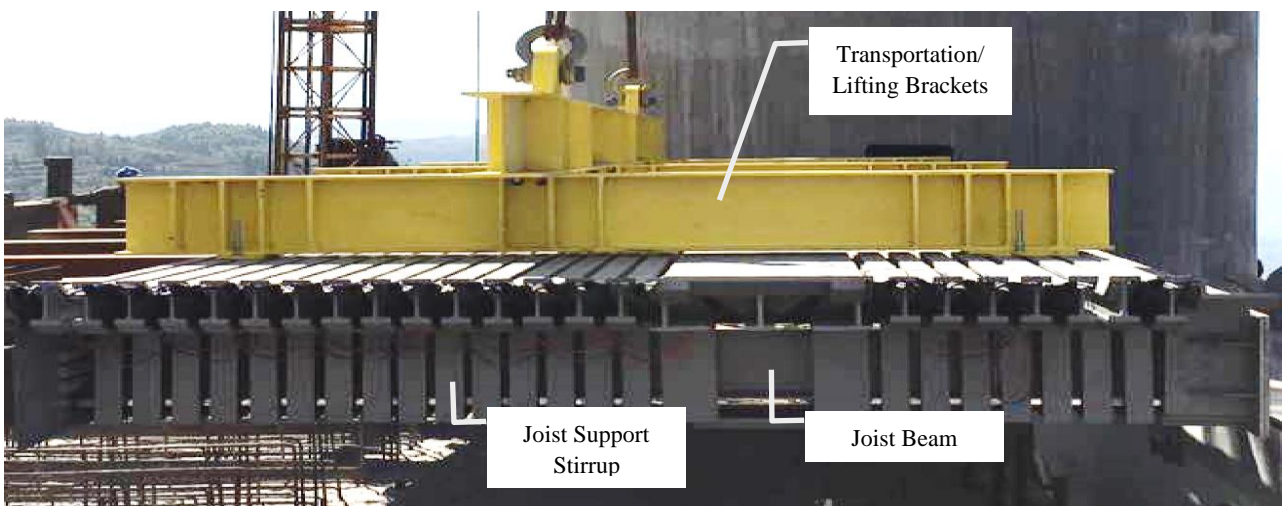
Installation of a TENSA®MODULAR LR26-FE expansion joint in a concrete bridge deck
